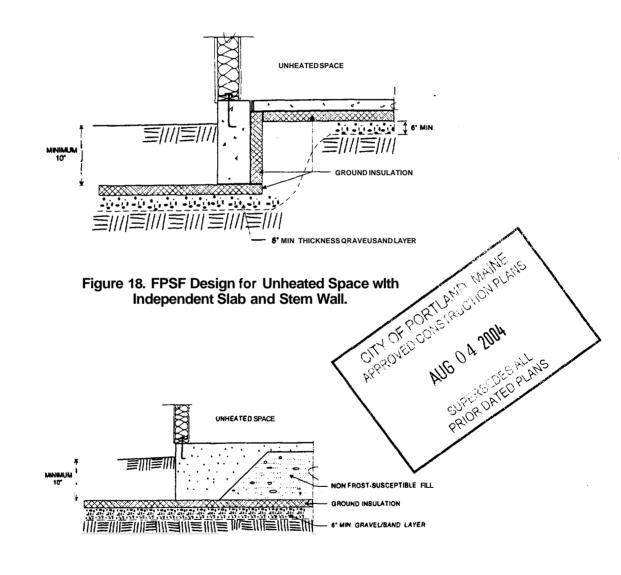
FPSF Design for Unheated Buildings with Insulation in Single Plane.
